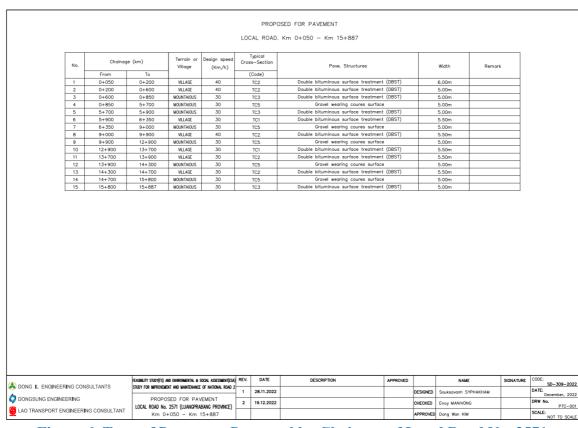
Type of Pavement Proposed by Chainage of Local Road No. 2571
